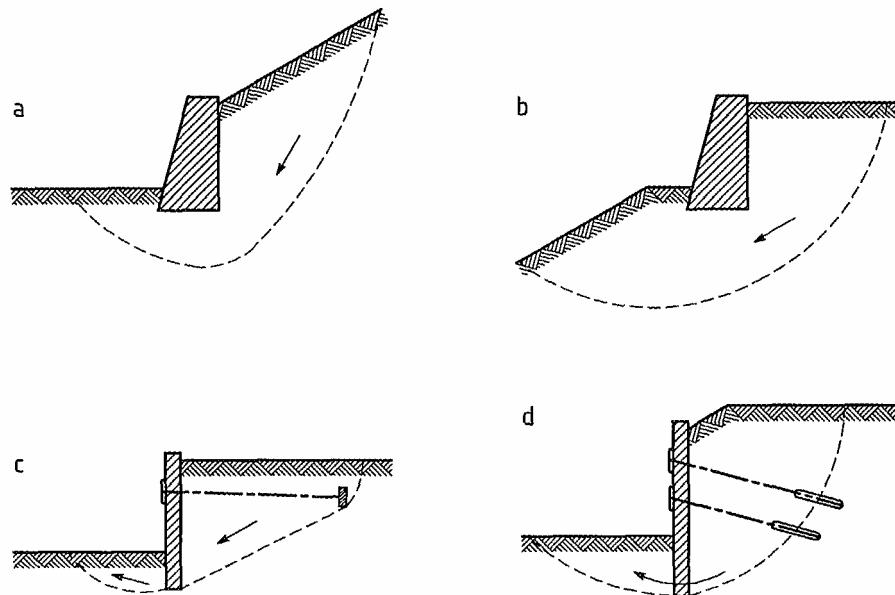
Examples of limit modes for overall stability of retaining structures.
